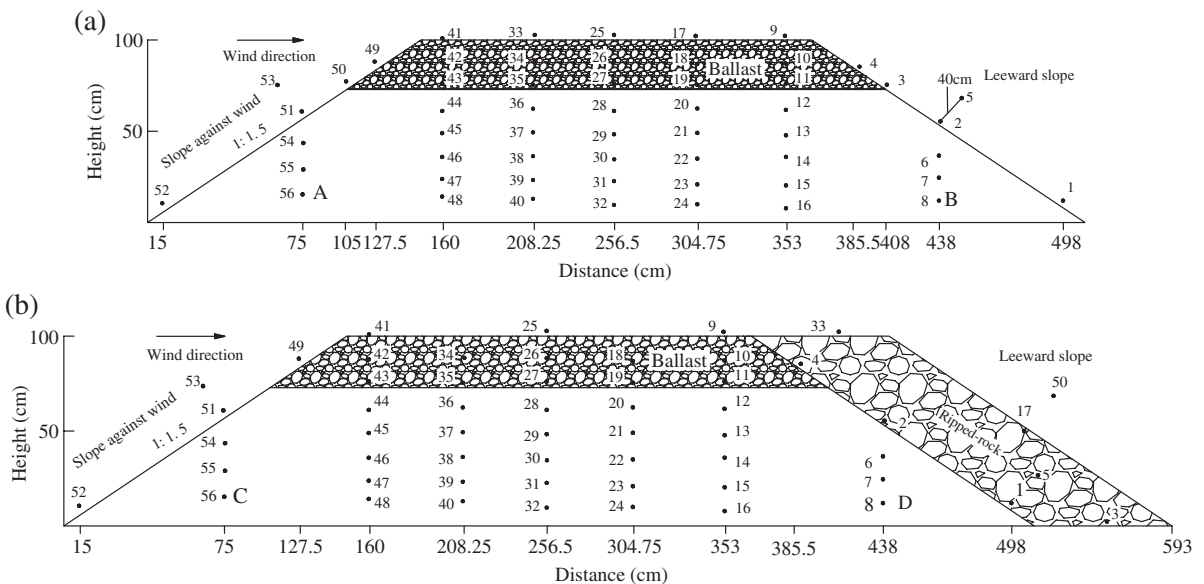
Cross sections of embankment models. (a) Cross section of the traditional embankment. (b) Cross section of the ripped-rock revetment embankment.
